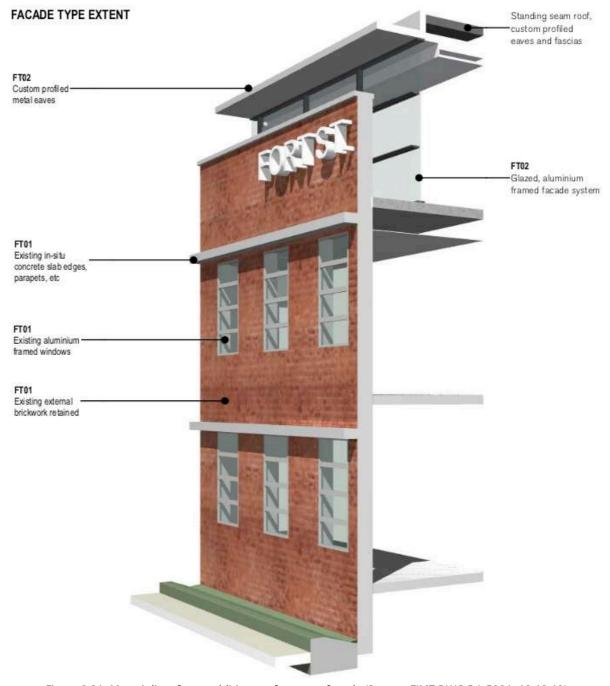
Materiality of new addition roof, eastern facade (Source: FJMT DWG DA-5901, 18.12.19) Messenger's Cottage
